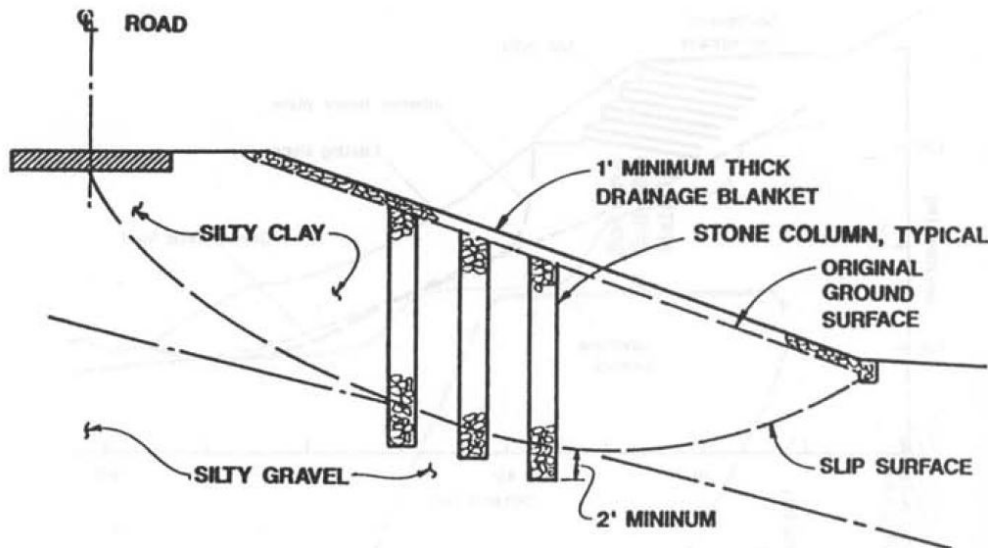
Stone columns stabilized unstable slope (Abramson et al., 2002).
